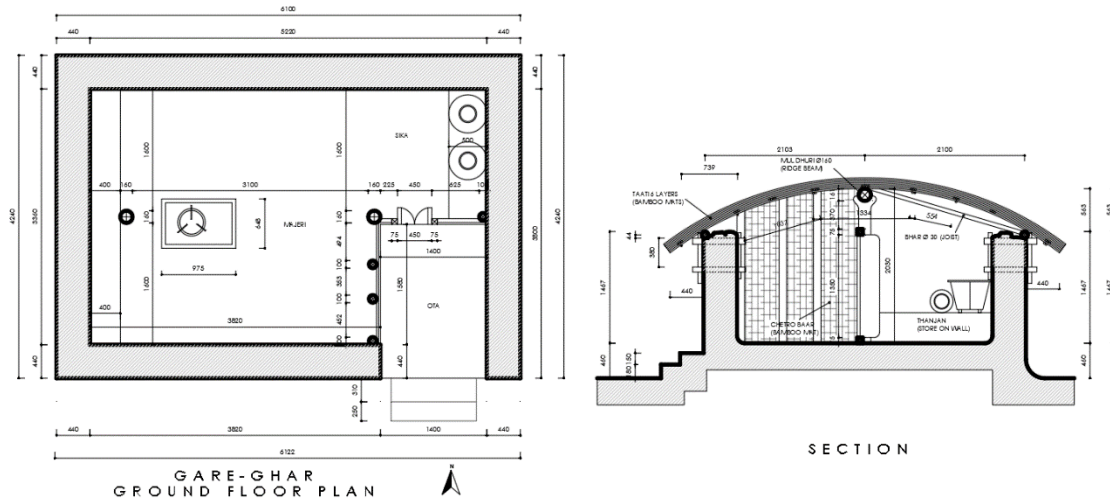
Plan and section of a reconstruction of earlier Chitre-ghar (bamboo mat house) later change to Gare-ghar
